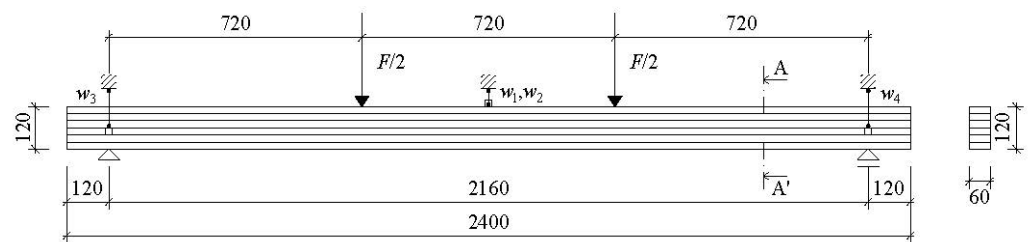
Geometry of the GLT beam test in the four-point bending test. Dimensions in mm.
